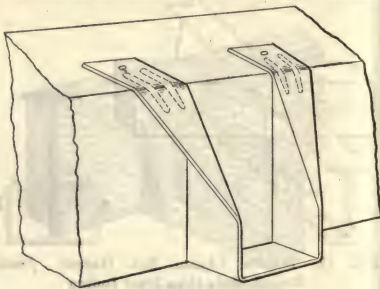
"Ideal" Wrought-steel Beam-hanger
